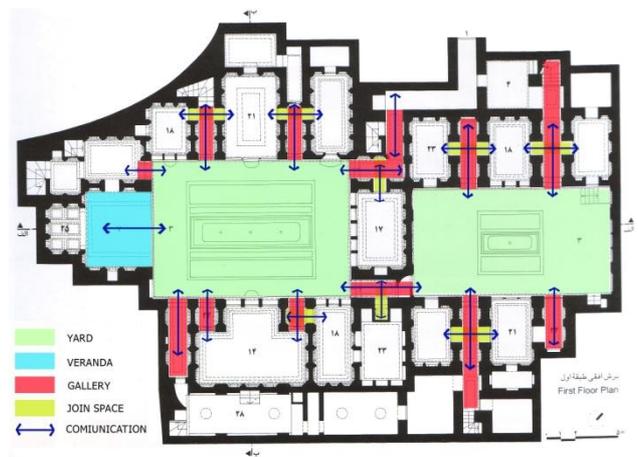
Plan of Gerami house, Yazd (source: Ganjnameh, Yazd houses)
